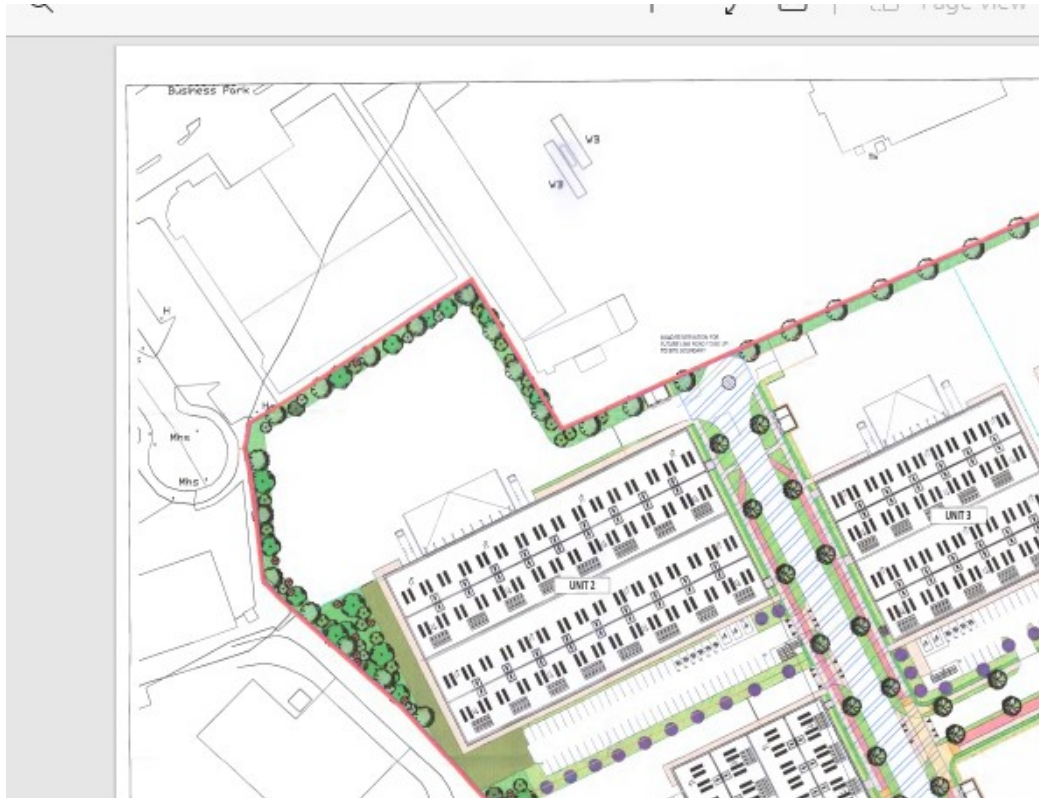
Extract from Proposed Layout Plan indicating road to be taken in charge.
